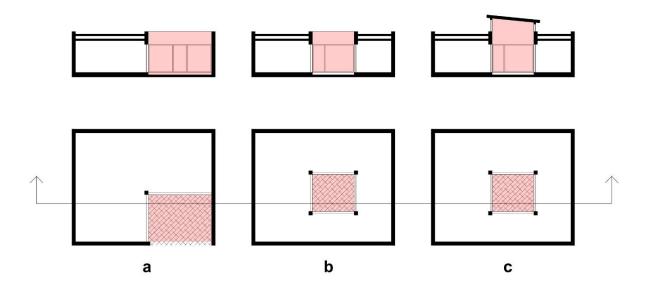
Schematic drawing of the cross-section and floor plan of the house: with a Patio (a); with a Courtyard (b); with an Atrium (c). Prepared by the Author.
